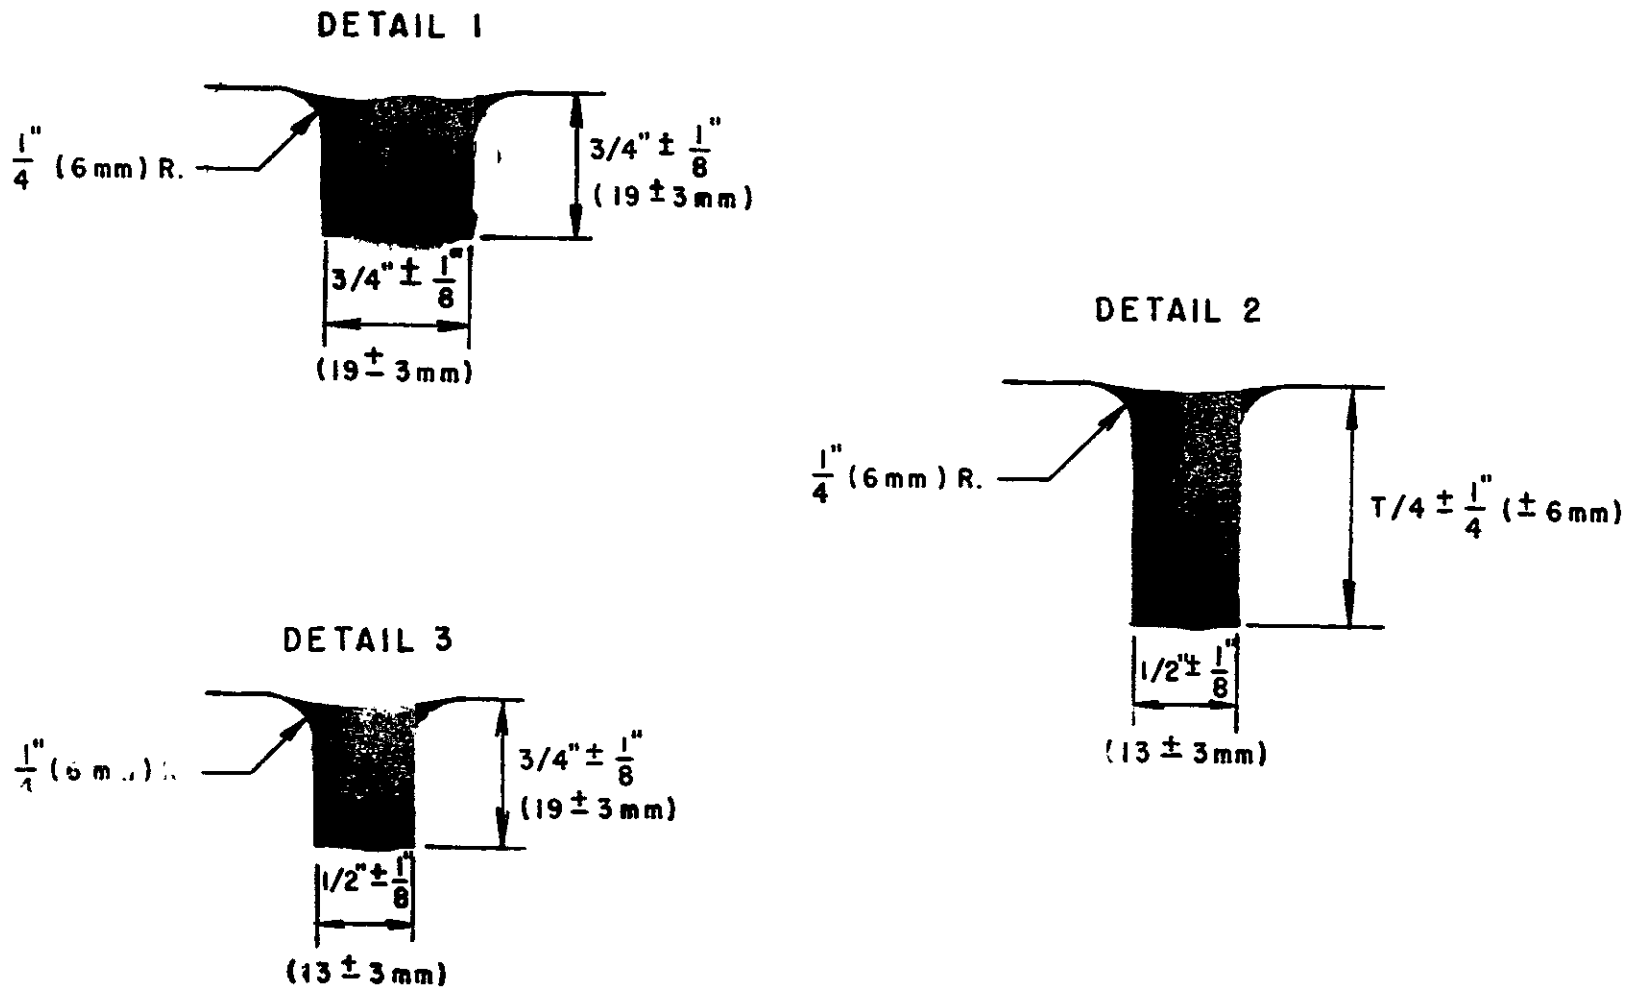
JOINTING DETAILS FOR LIGHT LOAD RIGID PAVEMENTS
